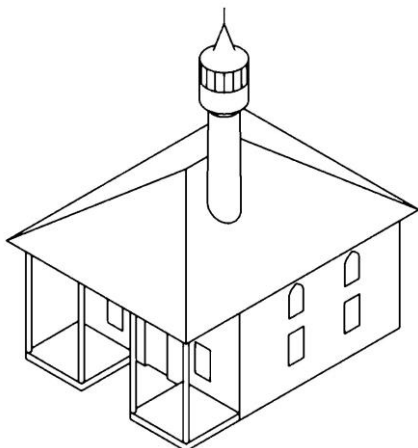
Model of typical roofed mosque with wooden minaret and a single story porch (Drawing by the author)
